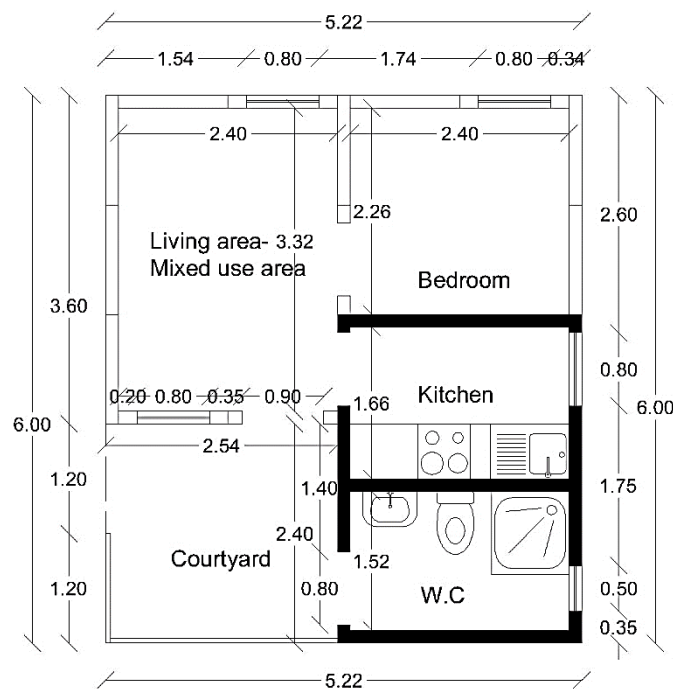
Final shelter outline proposal- basic plan for a family of four
